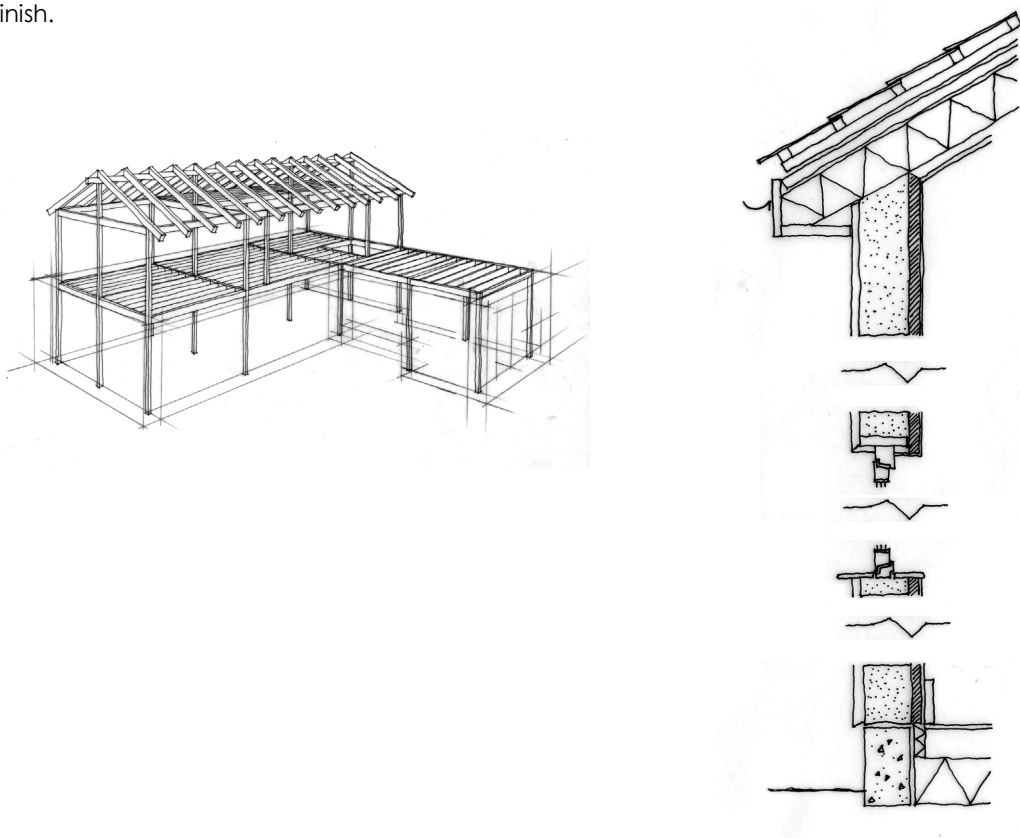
Timber frame with hemcrete cast in-situ to the outer edge of frame; Fig. 7.127 Detail of hemcrete construction with lime render or external cladding, hemcrete with timber frame within and vapour permeable carrier board and lime plaster finish
